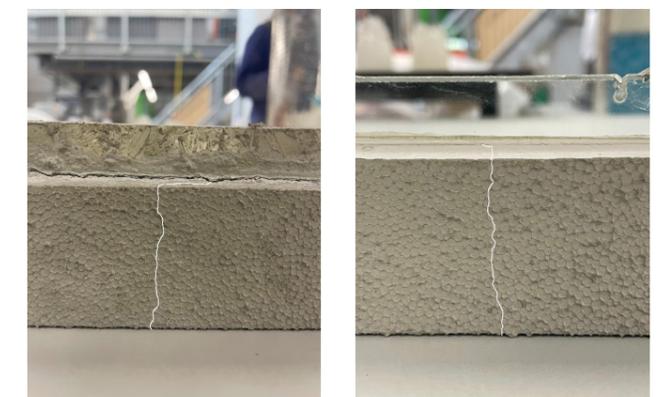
Cracks found in the bulk of the concrete bij concrete composition #1 (left) and #3 (right).
